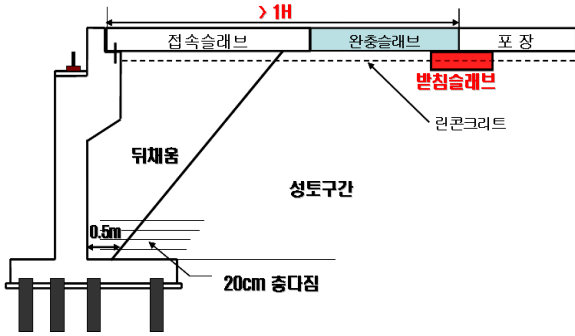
Typical Approach Slab System in the Concrete Pavement
